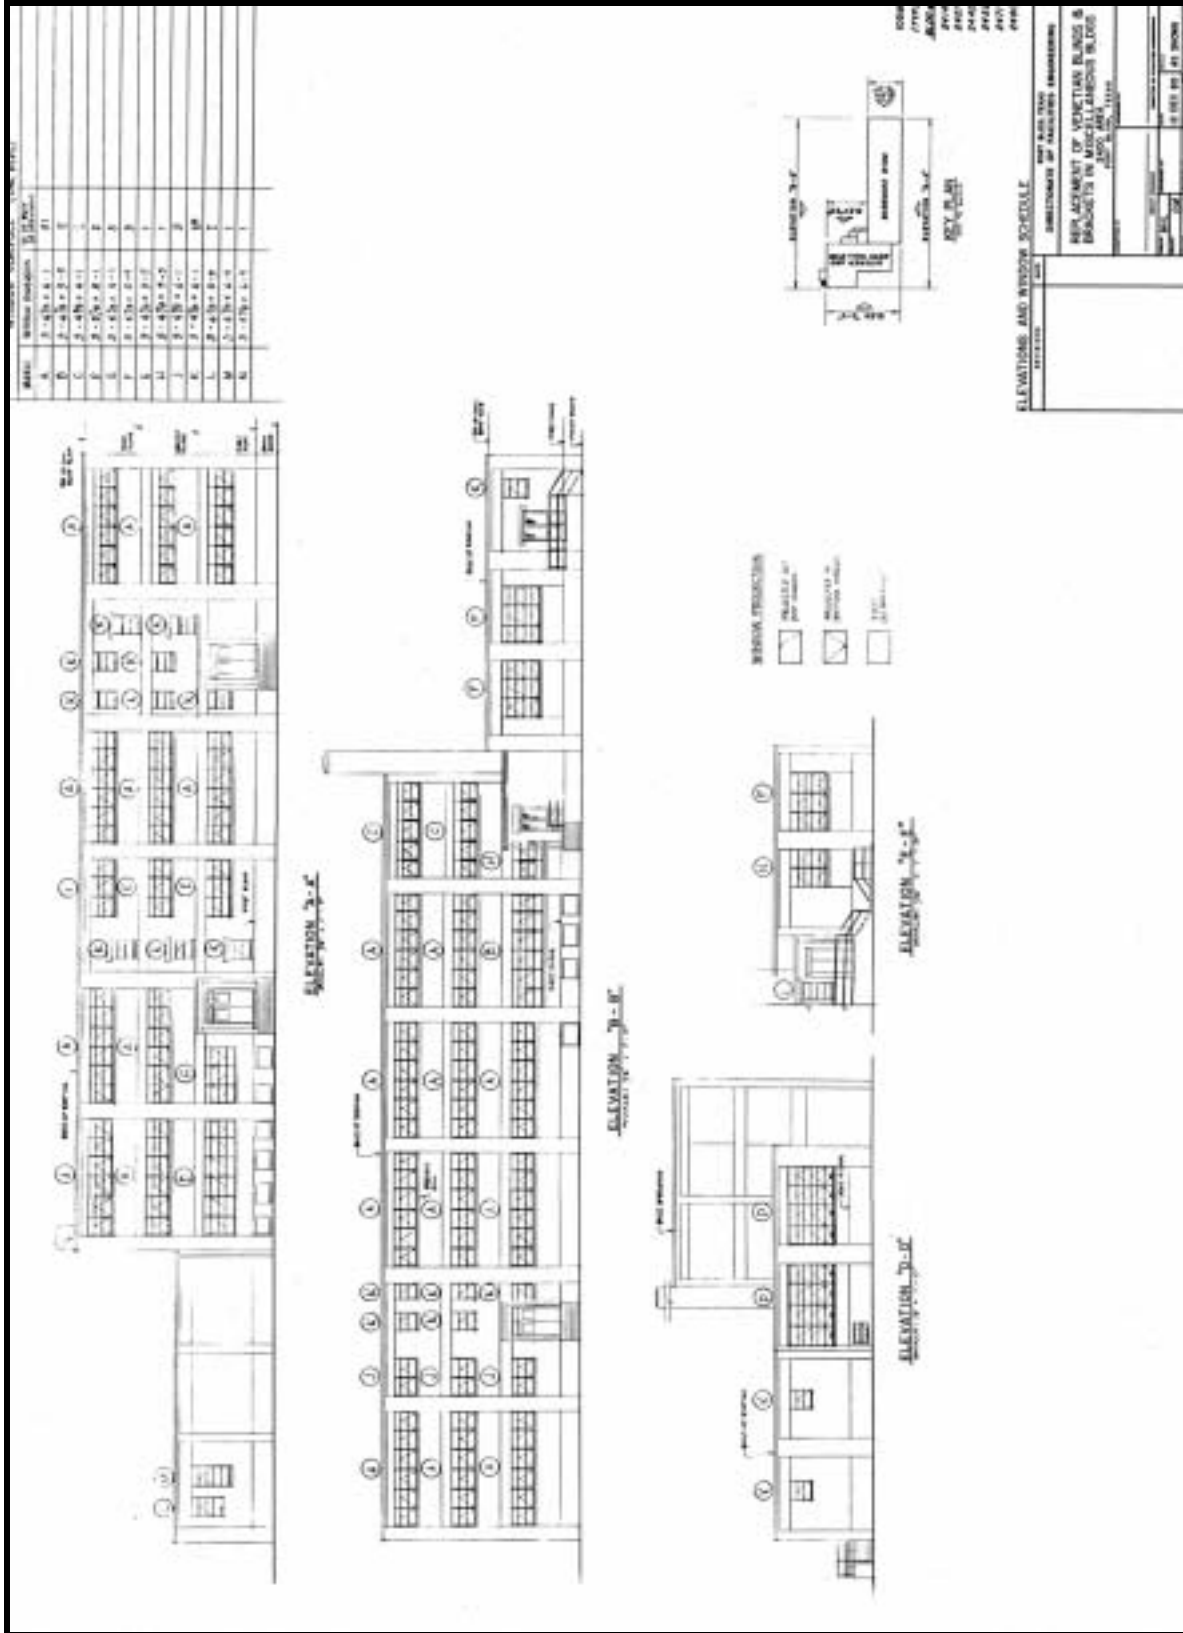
105-man hammerhead barracks, elevations (1980) (Engineering, Ft. Bliss).
